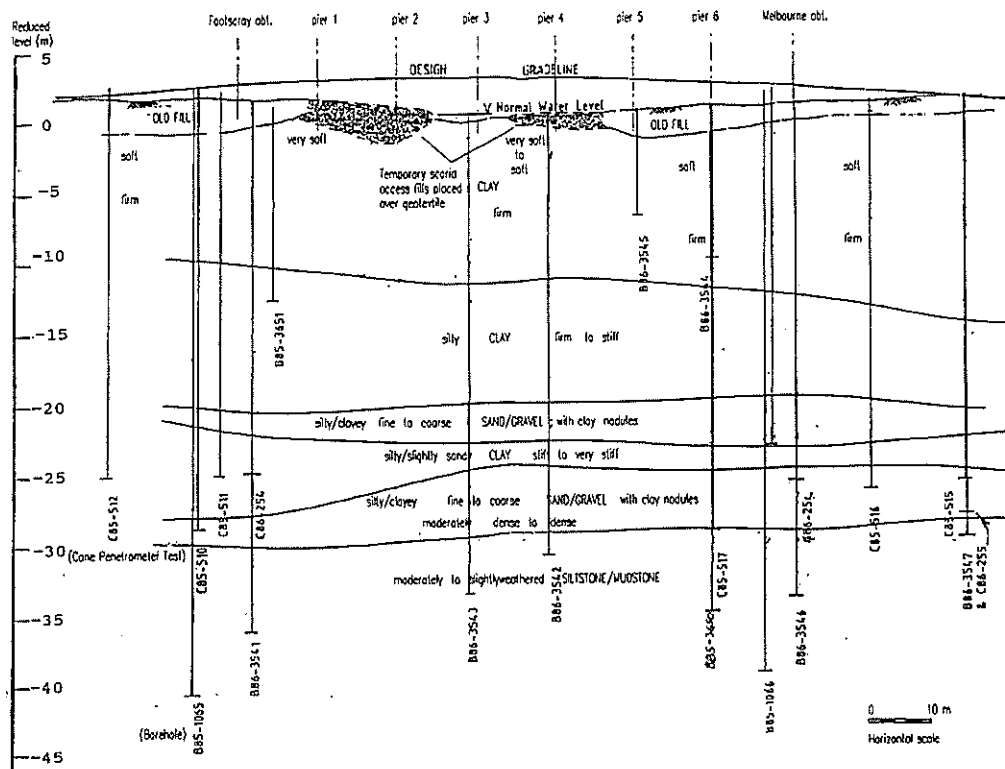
Sub-surface soil profile - Moonee Ponds Creek bridge site.
